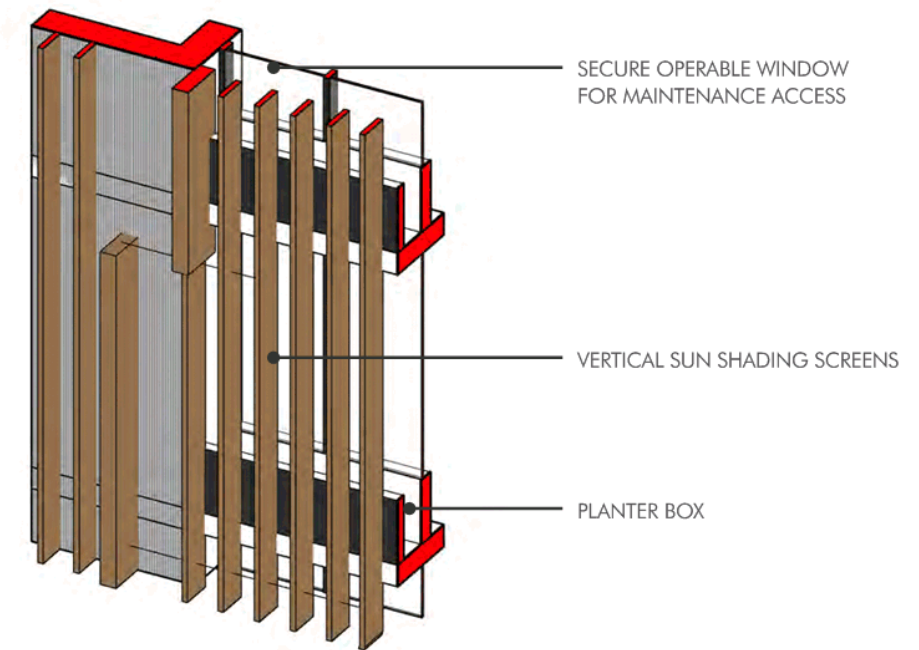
| SUNSHADING TO BALCONIES INFRONT OF BEDROOM WINDOWS
